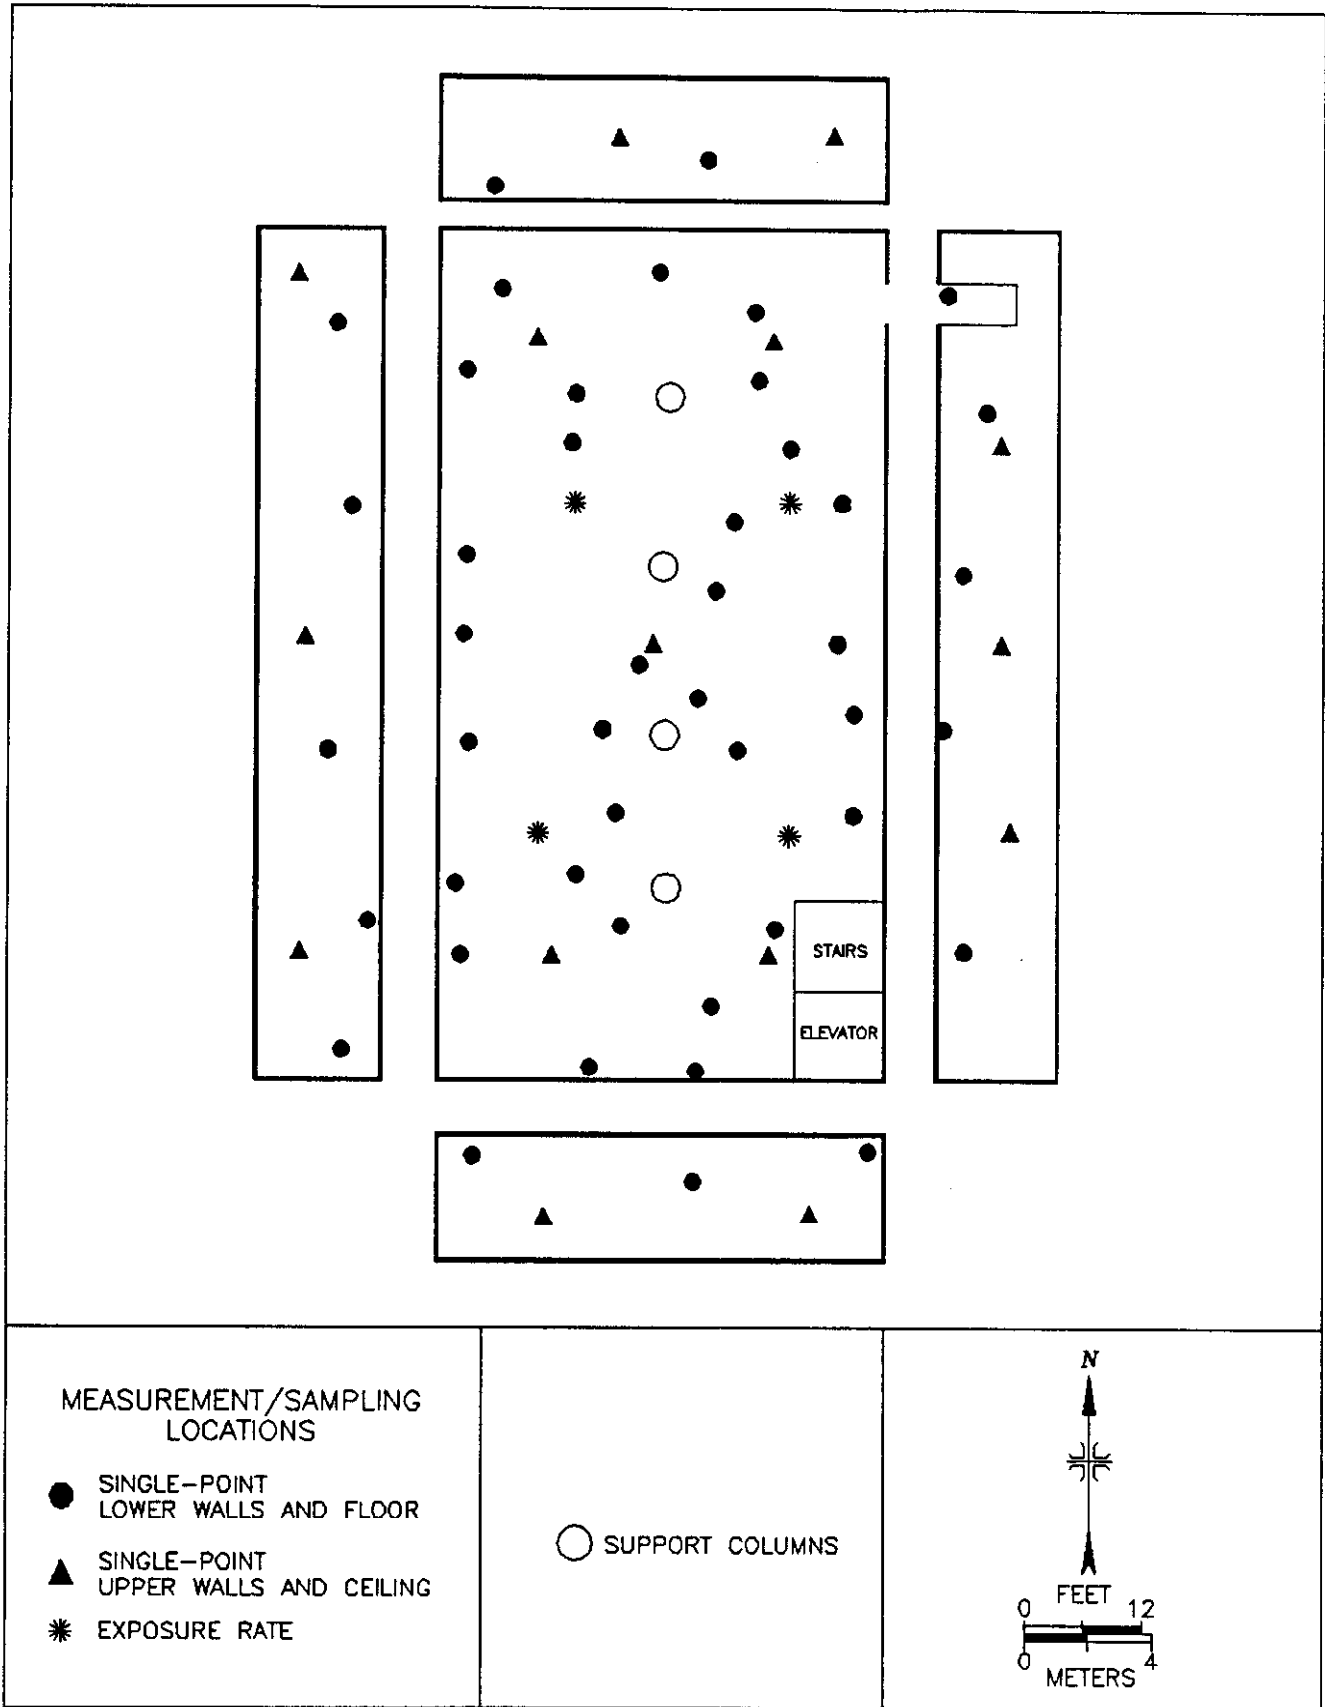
Seventh Floor, West Bay – Measurement and Sampling Locations
